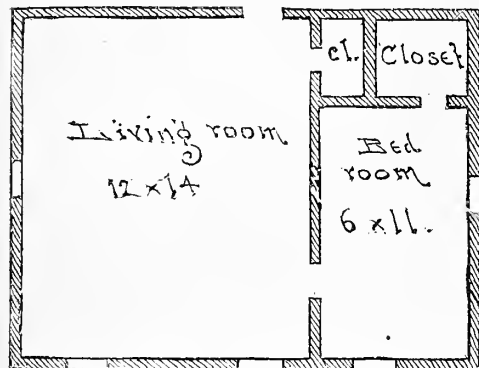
GROUND PLAN OF FIRST HOUSE.
